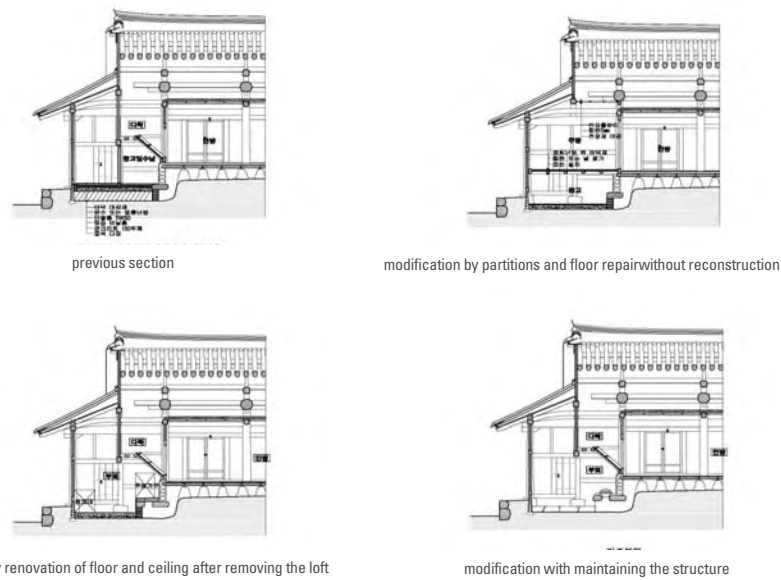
Design Guidelines for Modification of Layout and Structure (renovation of kitchen)
